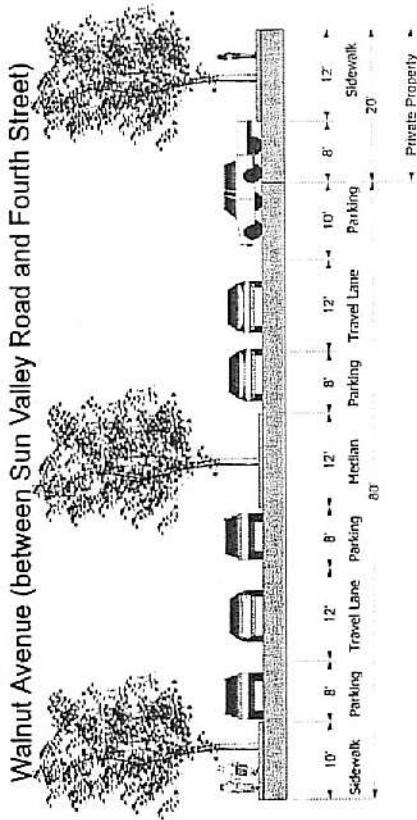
P: Walnut Avenue Retail Segment cross-section. Note that west side parking is changed to parallel to allow for a wider sidewalk and a small median. These minor modifications will substantially improve Walnut's retail/pedestrian draw.
